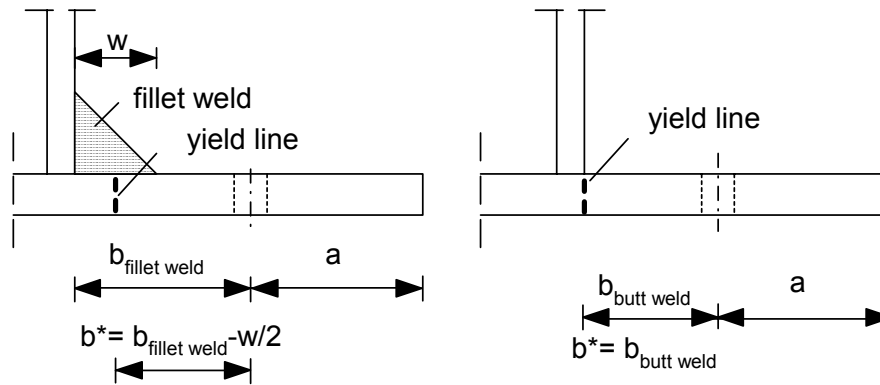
Shift of the yield line towards the bolt line due to fillet weld
